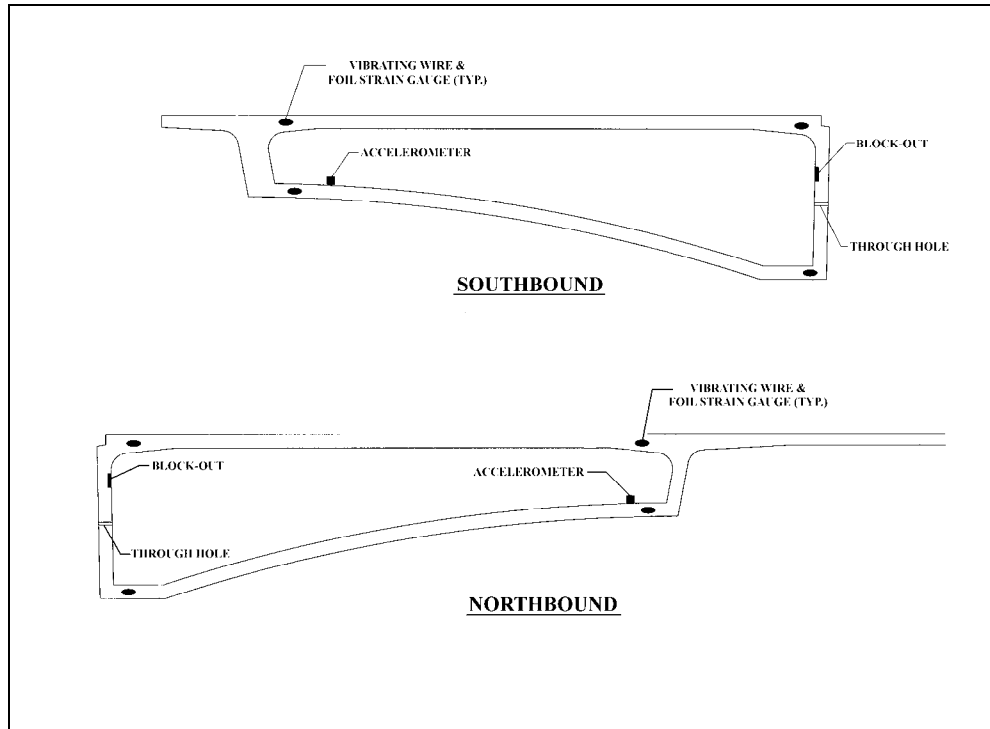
Precast Roadway Segments Type-I Gauge Locations (Modified IRIB Specifications and Construction Plans)
